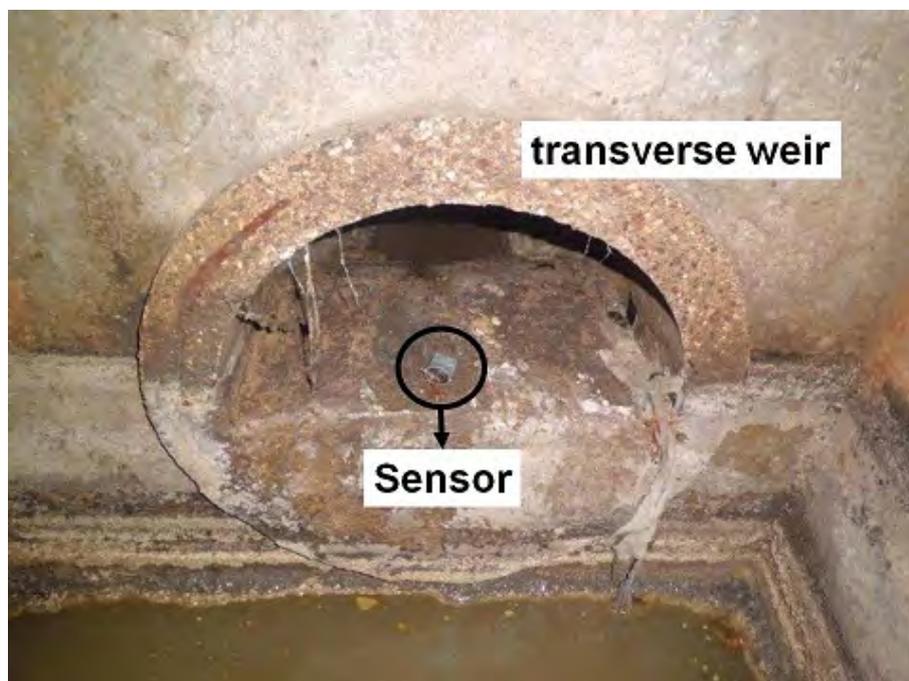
Detail of the sensor installation at the bottom center of a transverse weir.
